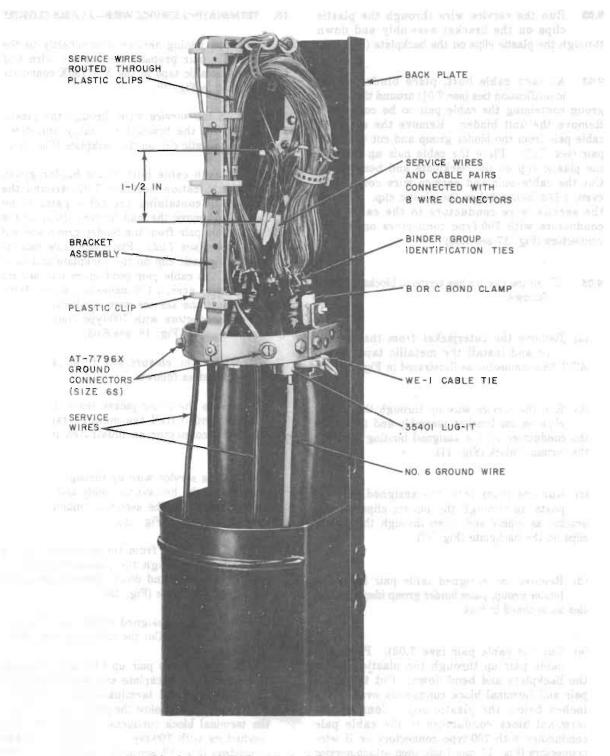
Service Wire Installed—E Cable Closure (Nonprotected)
